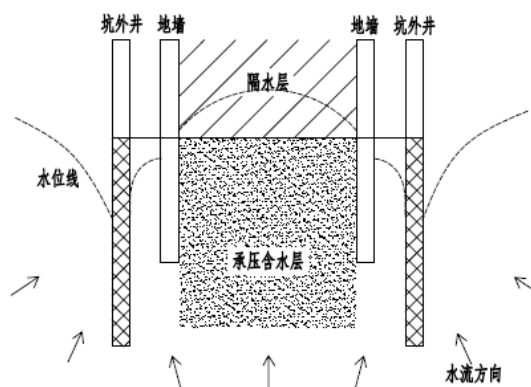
Schematic diagram of dewatering outside the hanging water-stop wall
